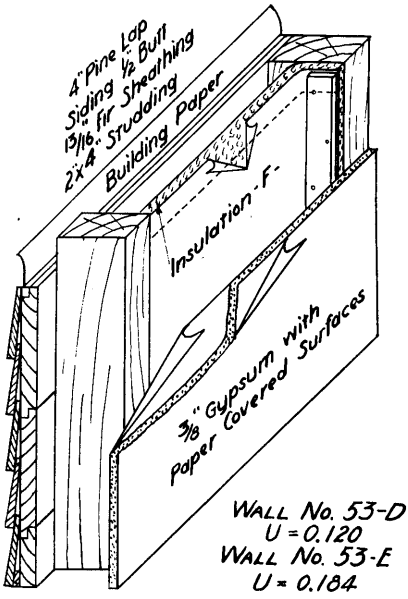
SECTIONAL VIEWS OF TEST WALLS
